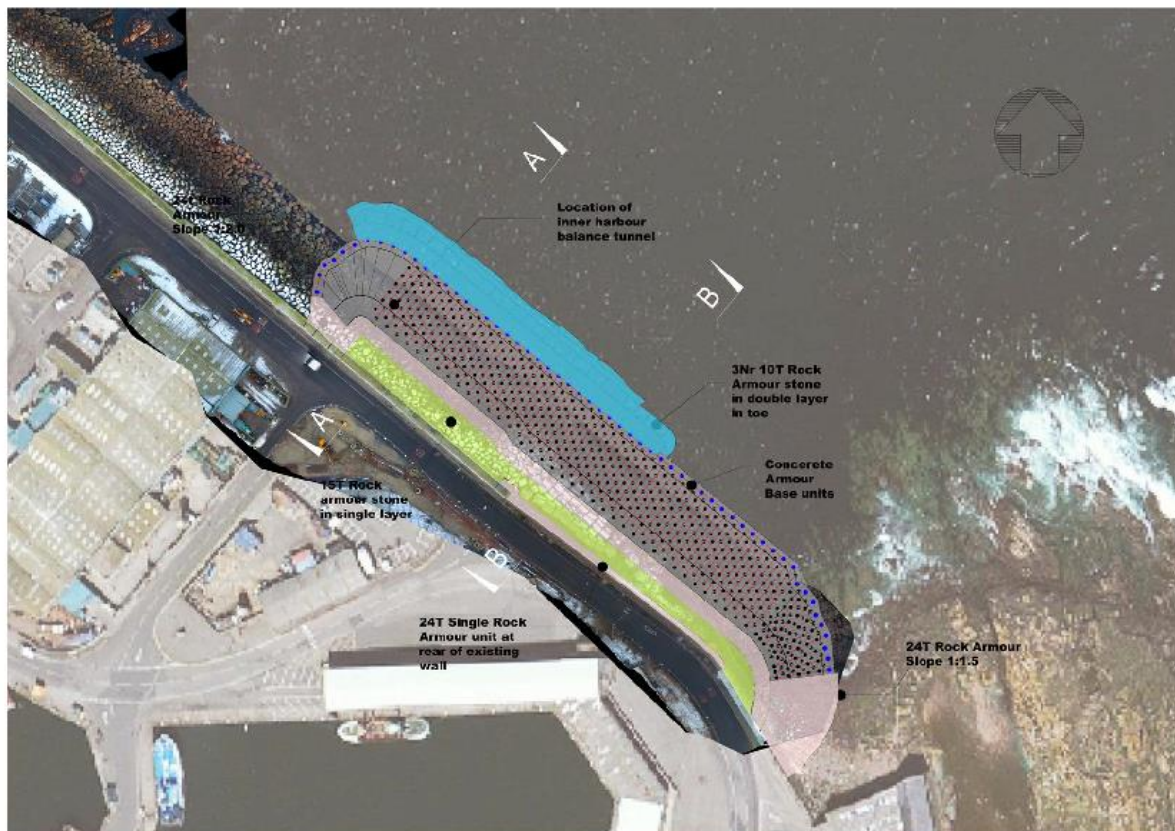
Extent of 1st stage of proposed revetment embankment structure at Alexandra Parade seawall
